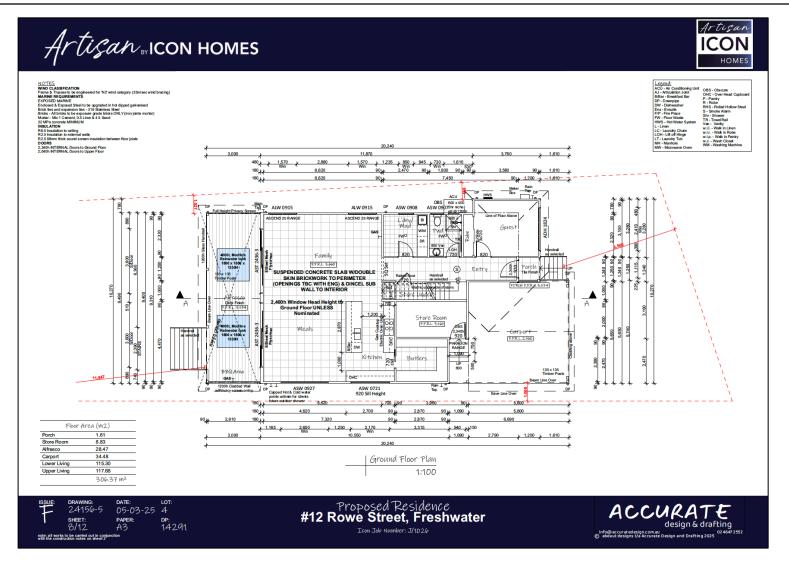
PROPOSED GROUND FLOOR PLAN
